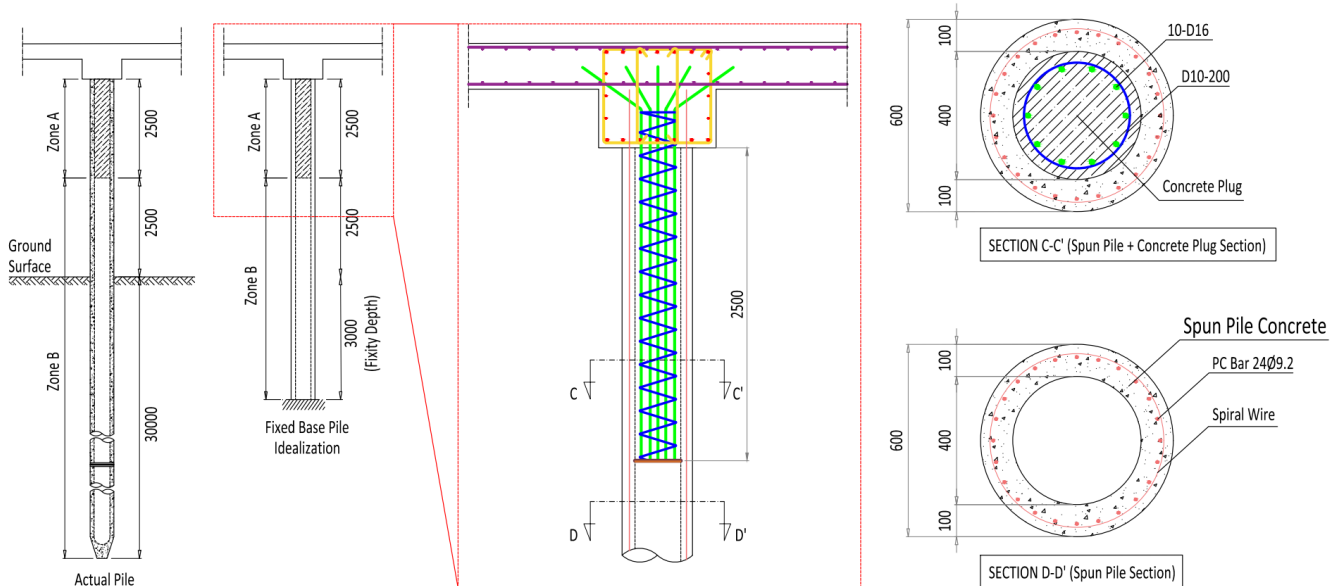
Detail of spun pile element and concrete plug (unit in mm)
